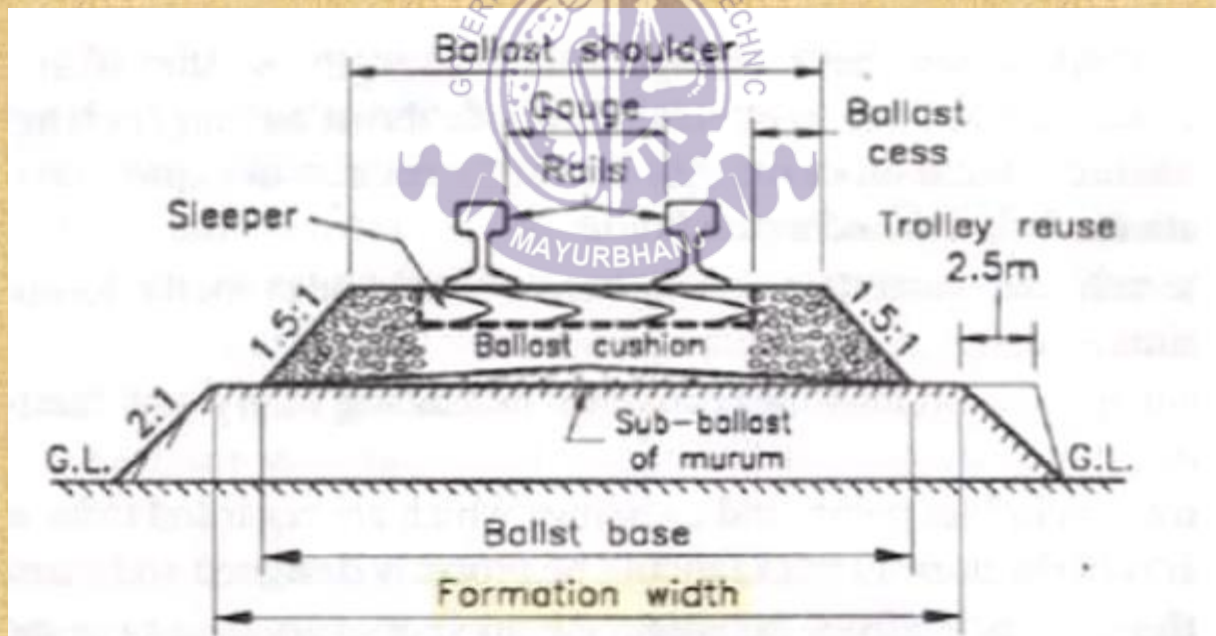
Typical Cross-section of a Permanent Way on Embankment.
